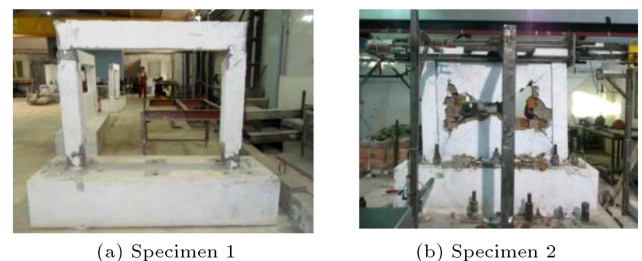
Damage observed in Specimen 1 and Specimen 2.
